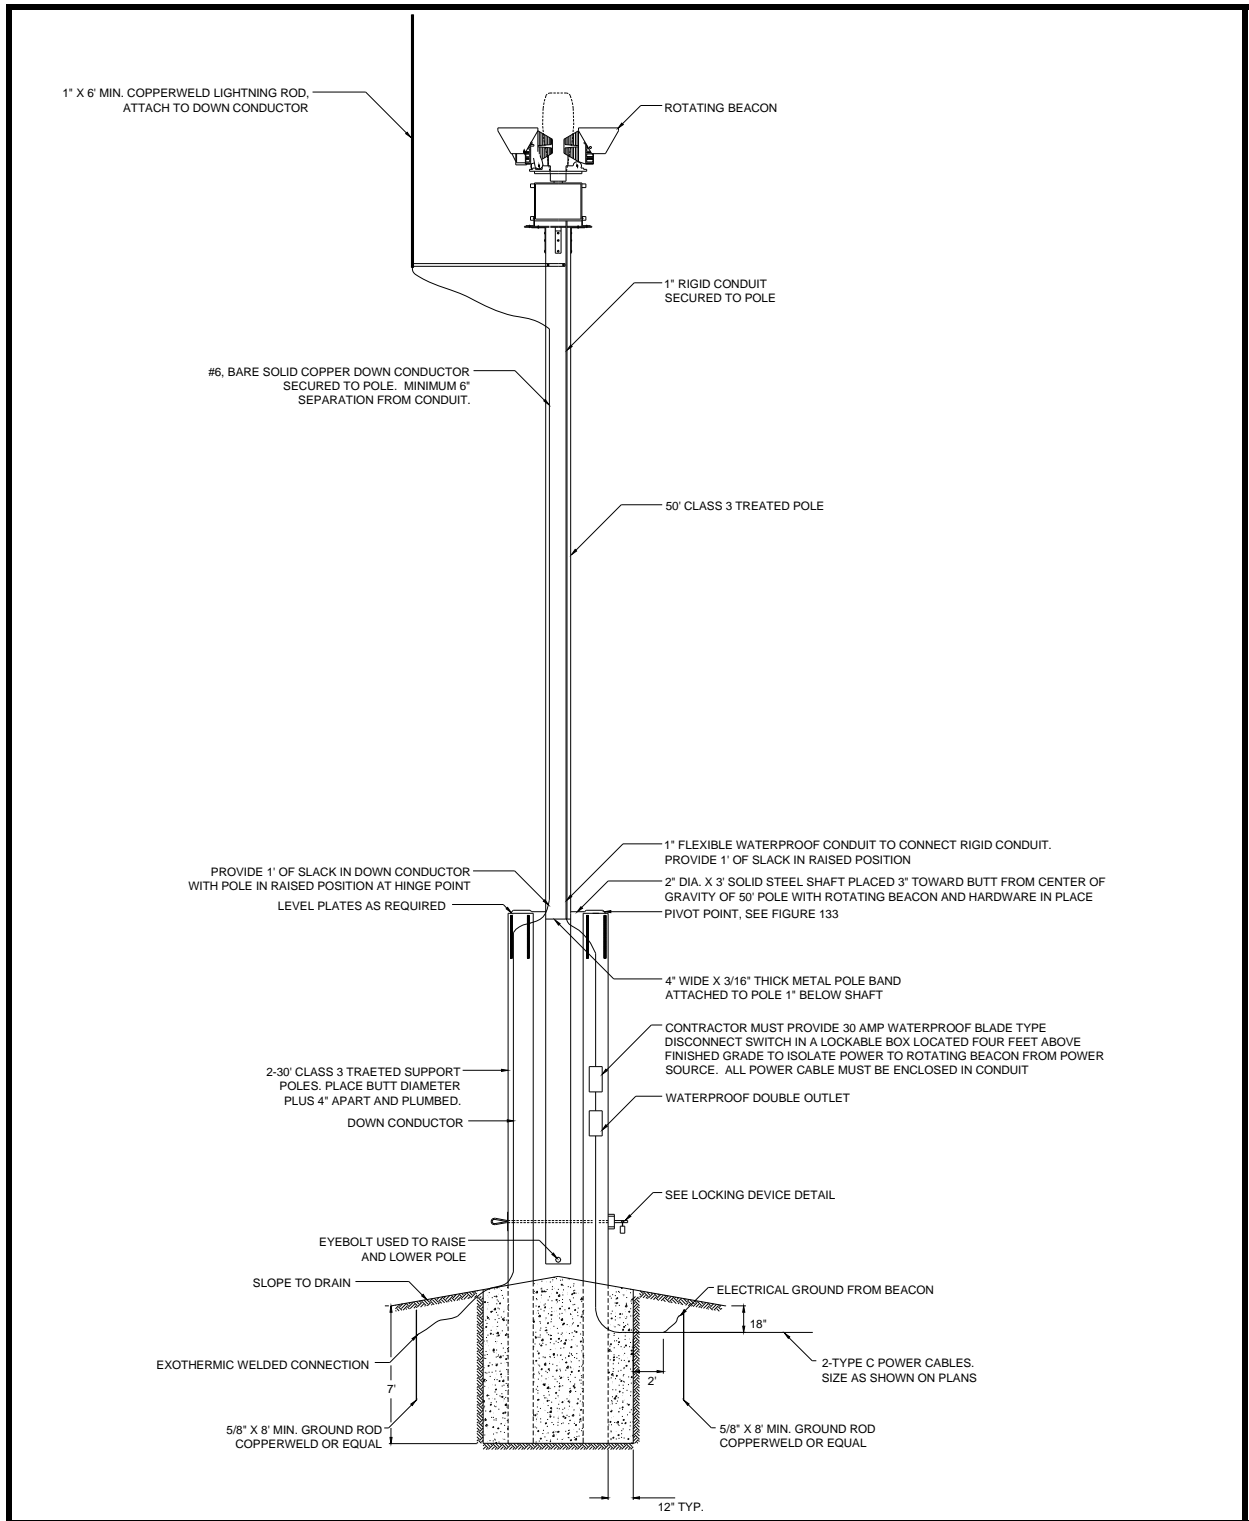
Standard Details for Pivoting Rotating Beacon Pole.
